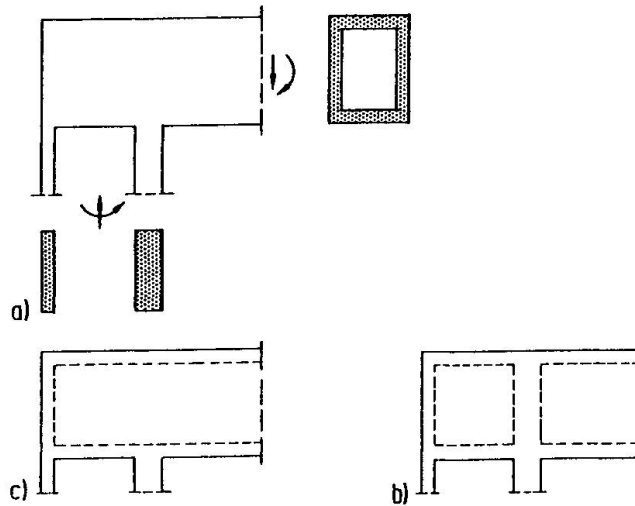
a) View and cross-section of the box girder and support walls. b) Longitudinal section with interior diaphragm wall. c) Longitudinal section without interior diaphragm wall
